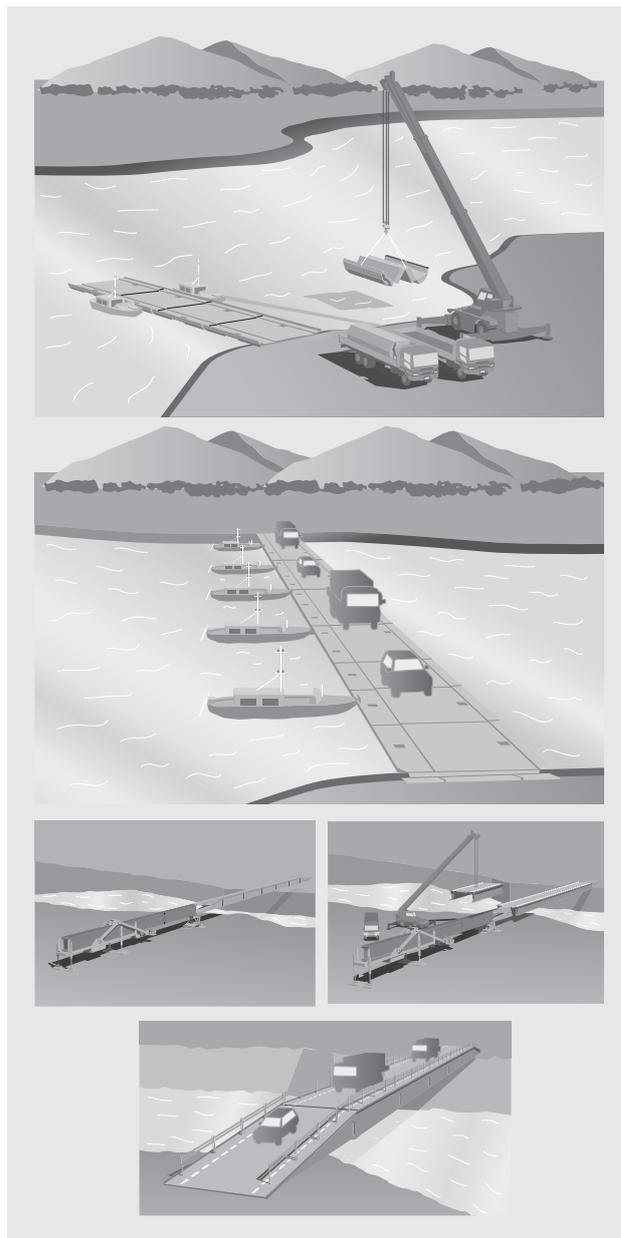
Example Civilian Uses of Prefabricated Temporary Floating Bridge and Prefabricated Temporary Span Bridge. Hitachi believes it can supply these bridges for civilian use at low cost by using general-purpose trucks, cranes, and other equipment.
